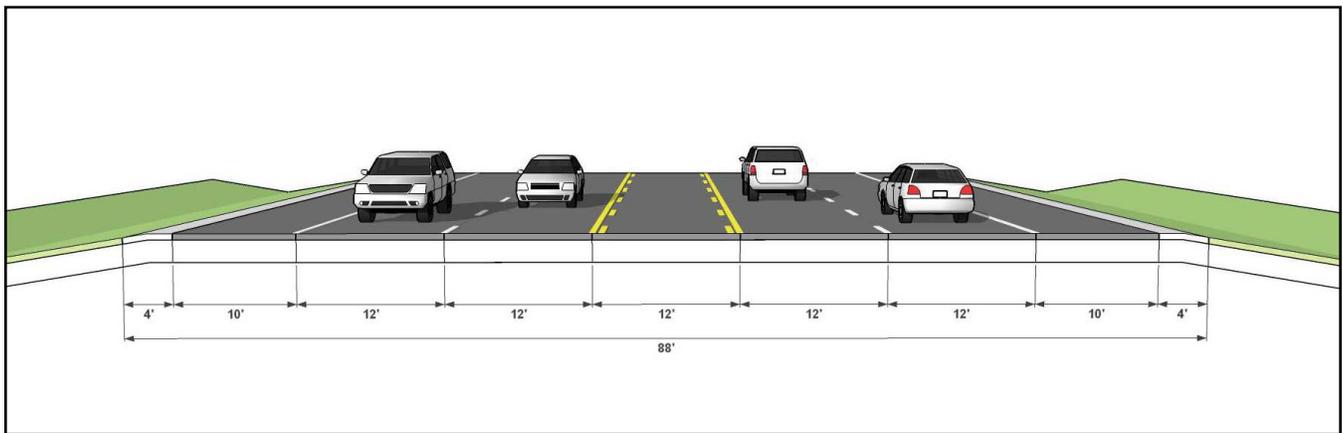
Northern Gateway Zone – Proposed Typical Section
